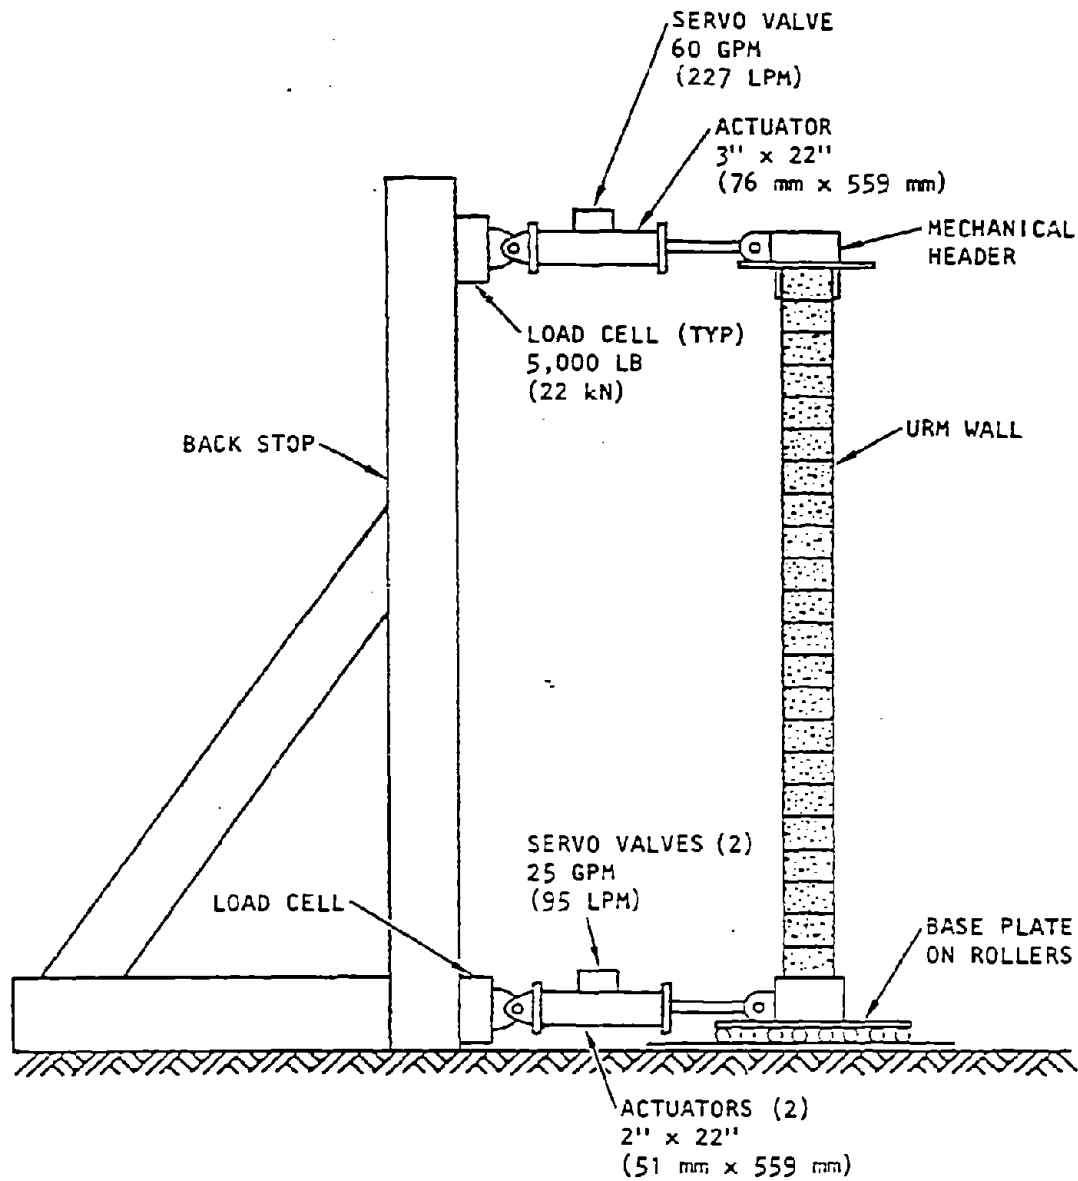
SCHEMATIC TEST SETUP FOR DYNAMIC TESTING OF WALLS
